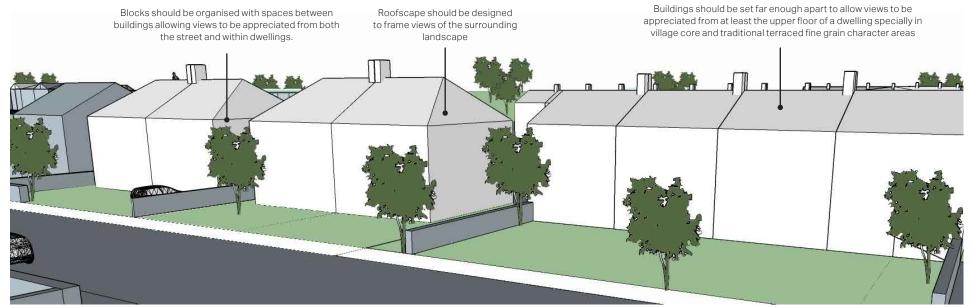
Diagram illustrating the enhancement and framing of views to surrounding landscape
